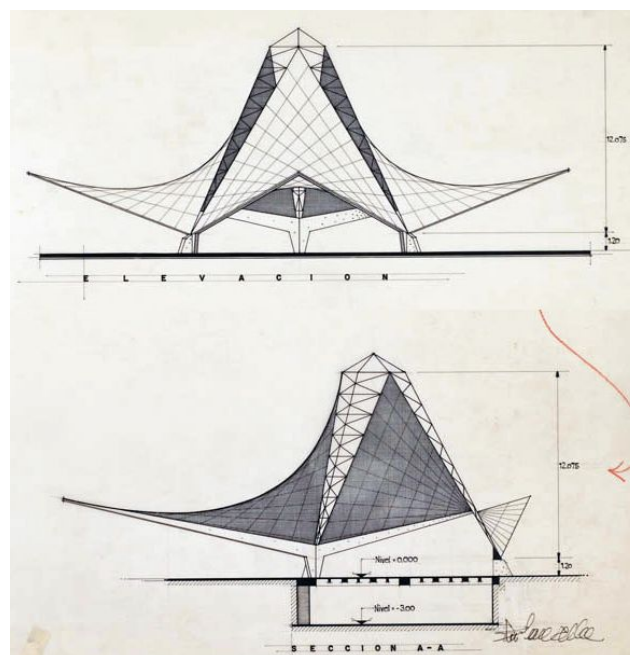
Elevation drawings. Light is allowed to pour into the building space from articulated strip glazing between smaller shells. San Vincente de Paul Capella, Mexico City (copyright Felix Candela Archives)
